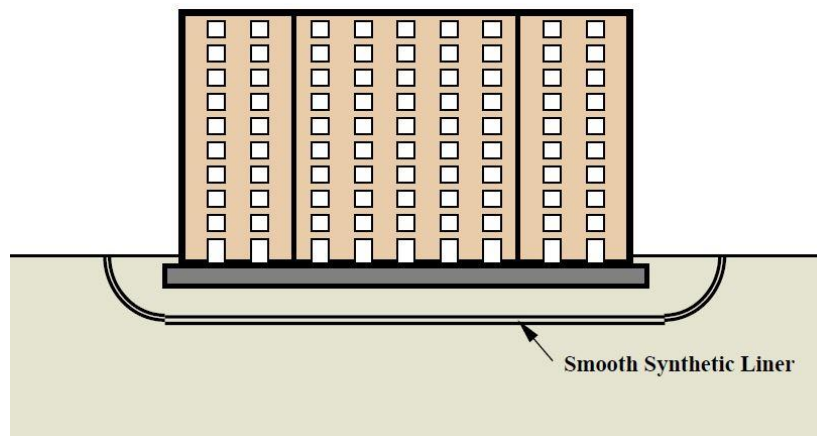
Schematic Drawing of Tub Shaped Soil Isolation System (Tsang, 2008).
